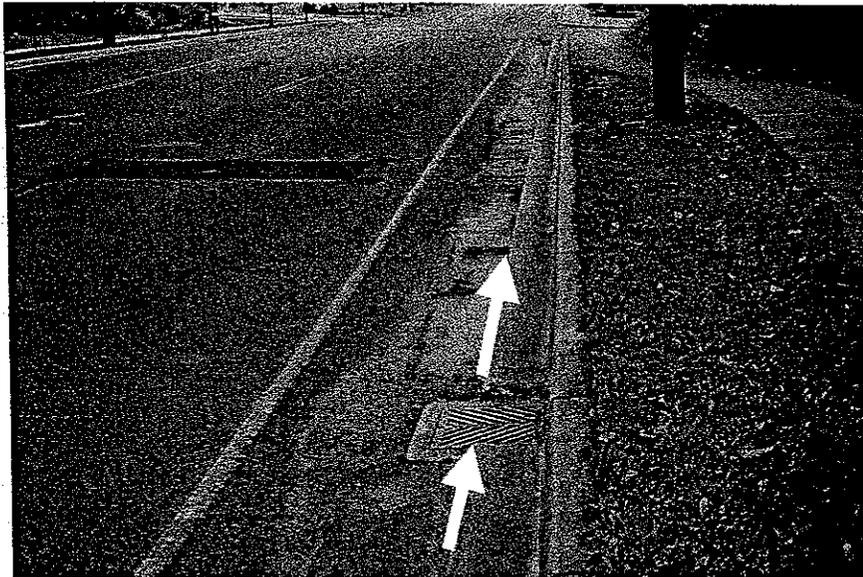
Downstream catch basin from photo 7 along Sultan Basin Road conveying runoff south.
